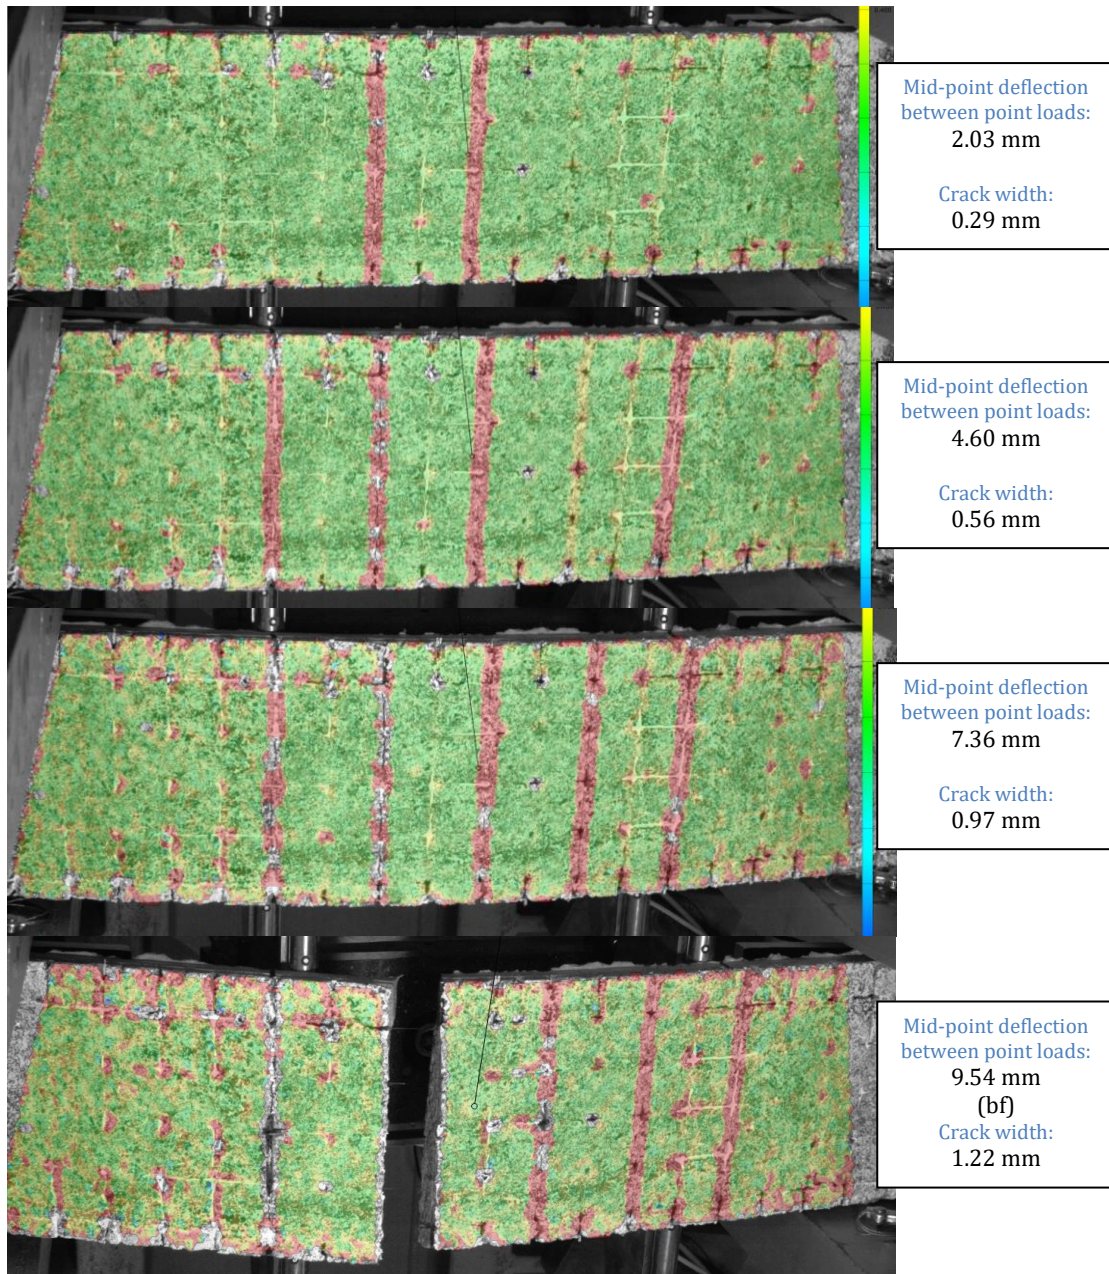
Crack propagation of specimen S1-2, early, middle, late, and at failure (from above).
